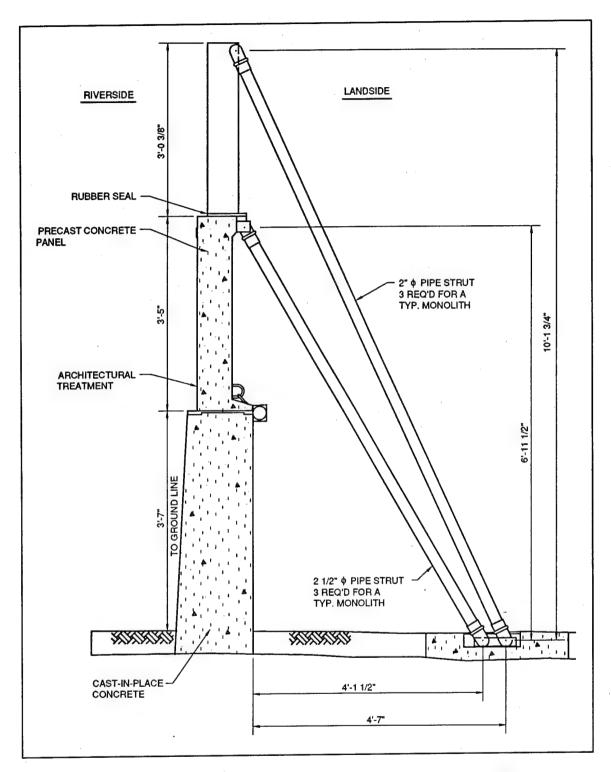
Typical wall section with upper and lower panels erected, Bettendorf Floodwall
